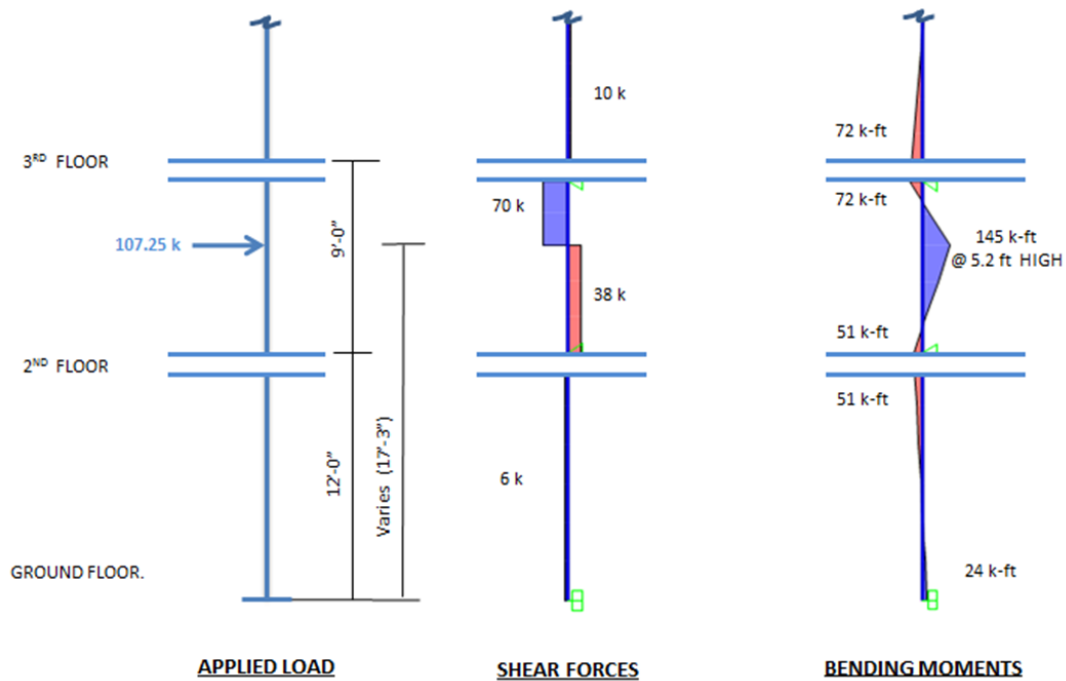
Impact load applied at $d + h_c$ away from the end of column on the 2nd floor
